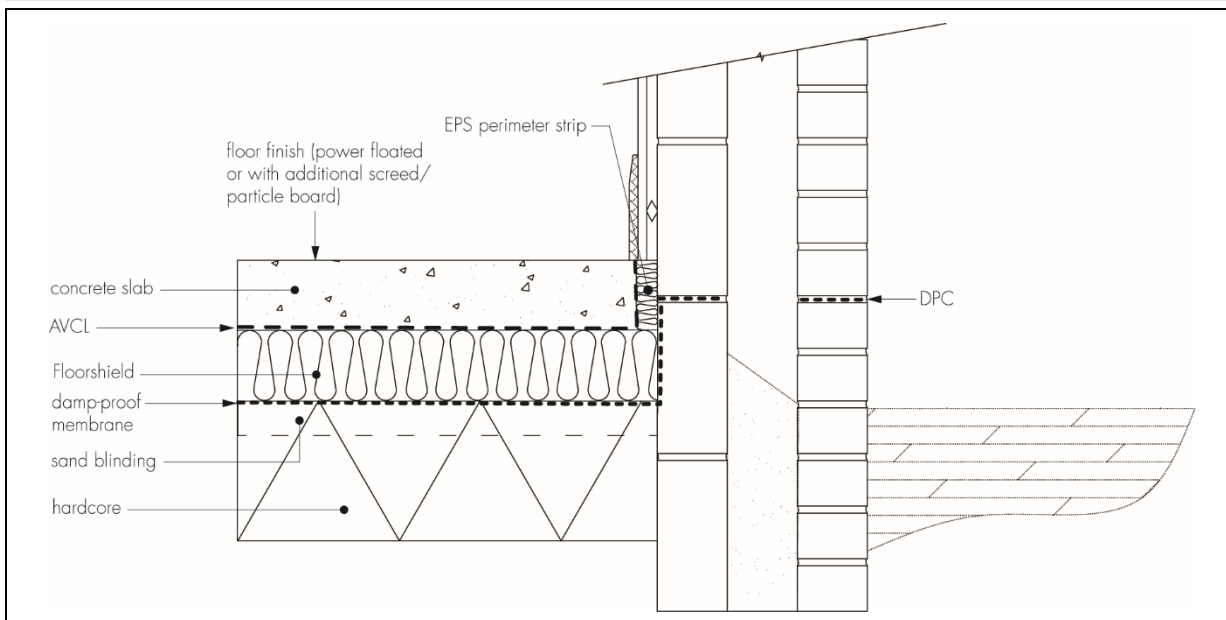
Typical installation details — suspended concrete ground floor with DPM and AVCL
